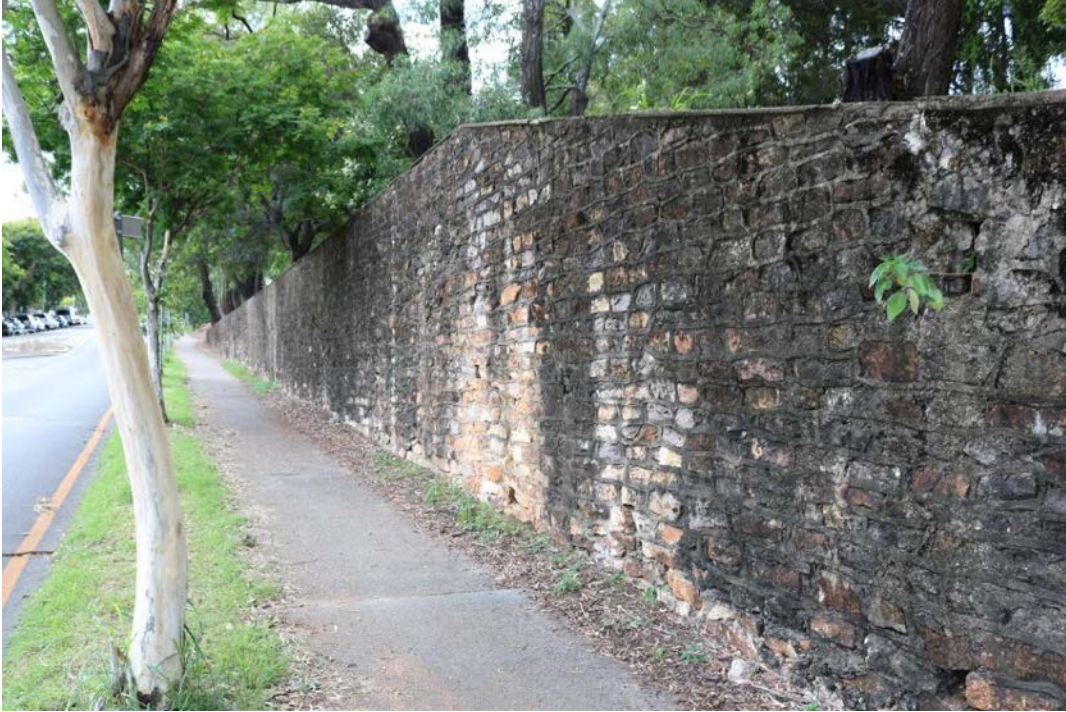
Stone Retaining Wall, Herston Road, Northwest Park Section, looking east (Queensland Government, 2025)
